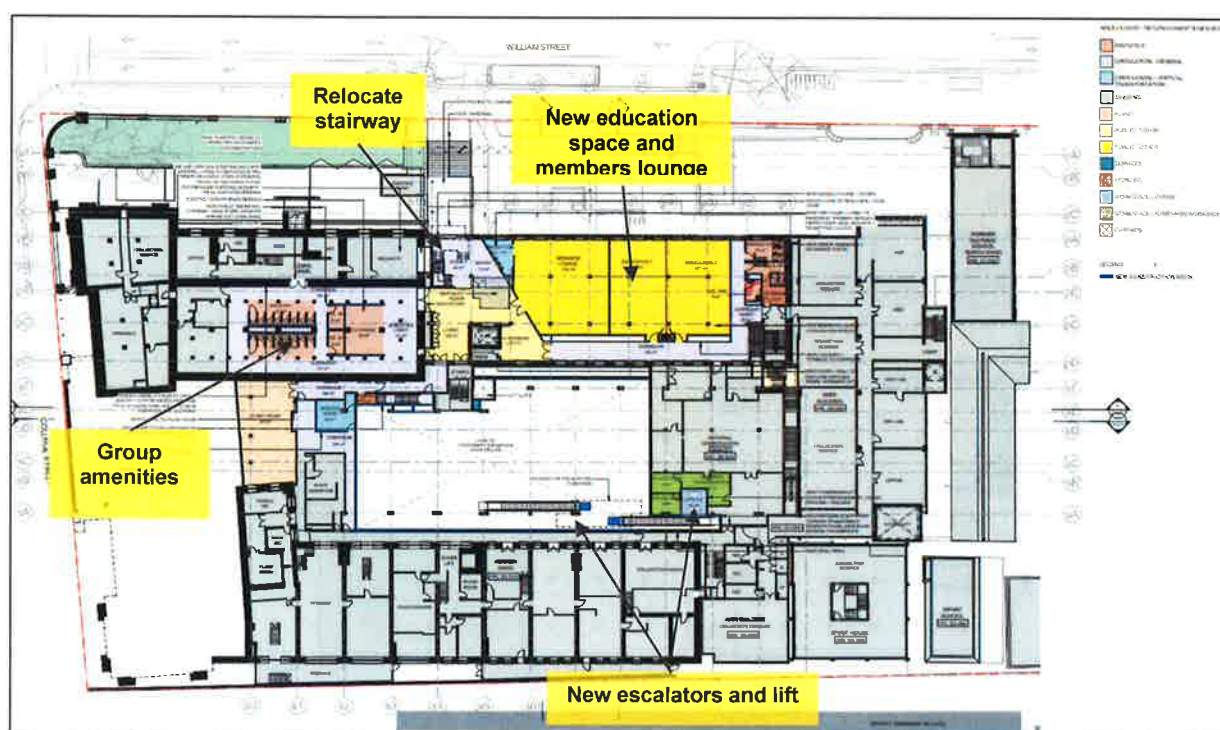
| Lower Ground floor plan (Source: Applicant's RtS).
